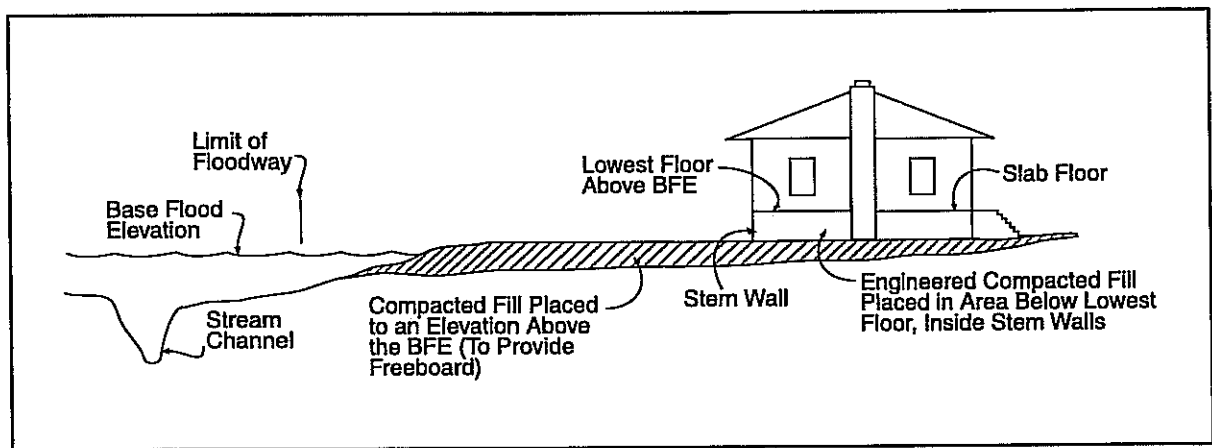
Structure on a stem wall foundation. The lowest floor is raised above the BFE. The space enclosed by the stem walls is filled with engineered compacted fill.
